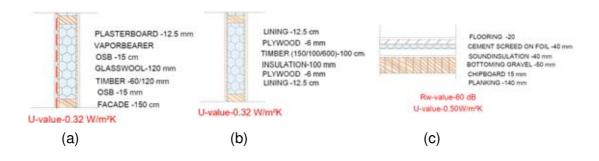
Outer (a), inner (b) wall and floor (c) composition of Building 3
